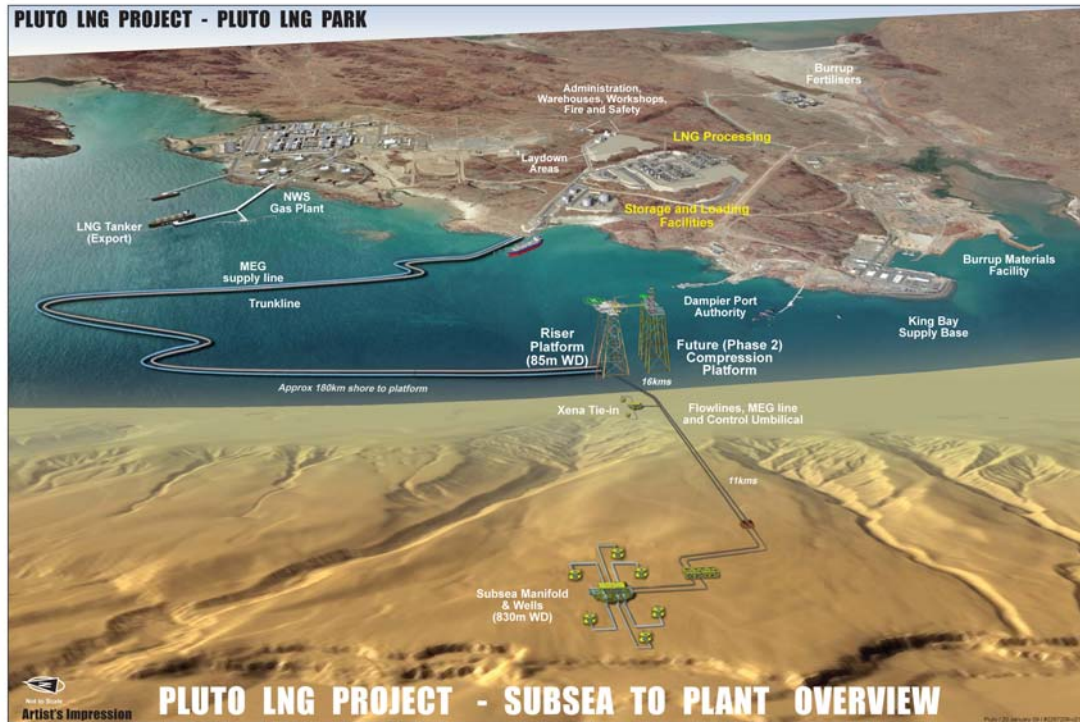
Approved Pluto LNG Project Conceptual Layout
